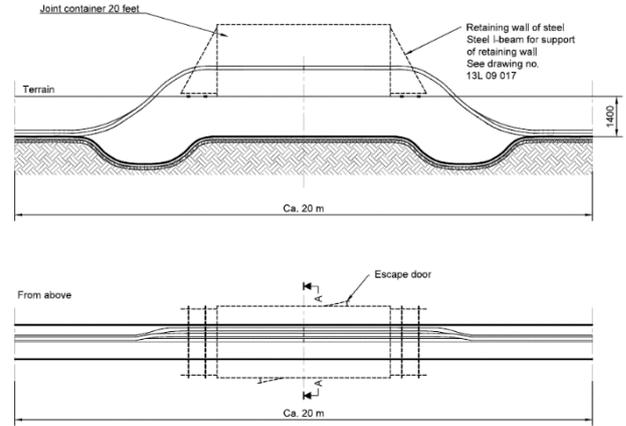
Side view sketch of a cable joint bay. The jointing is seen to be performed over ground, where after cables and joints are lowered into the joint bay.
